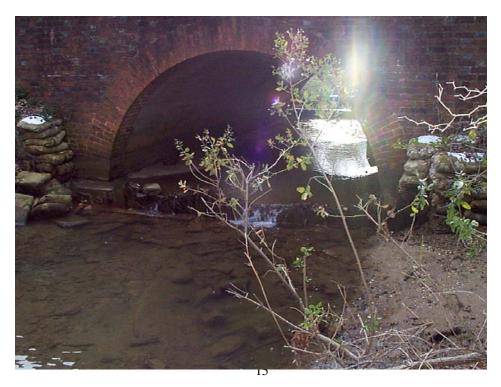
Bridge over Wormley Creek with Wormley Pond in background. Irish ramp was set under upstream edge of bridge at the base of the dam.
